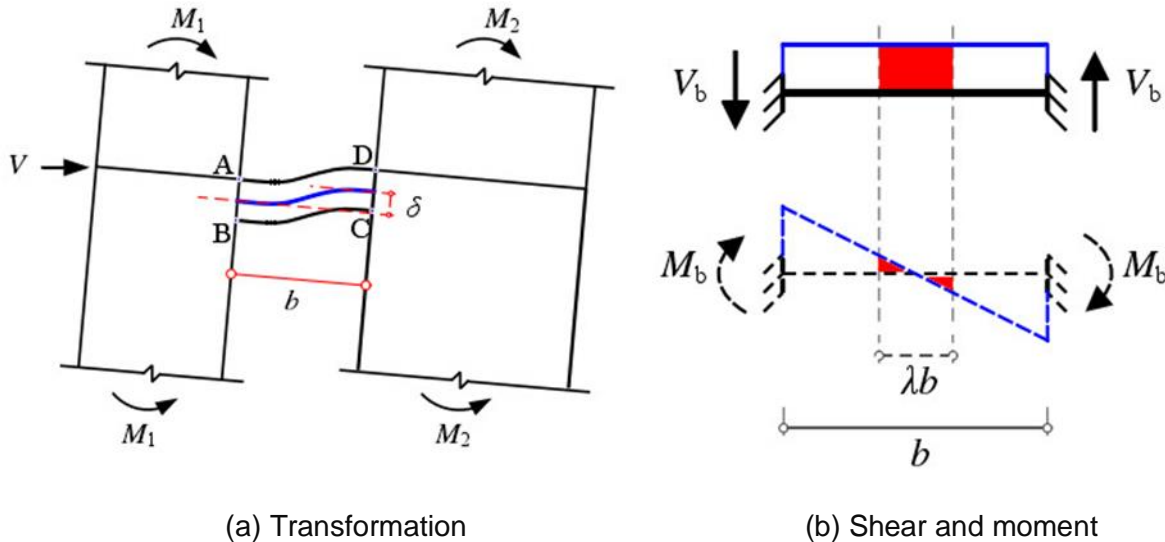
The deformation and internal force of the connecting beam under horizontal load
